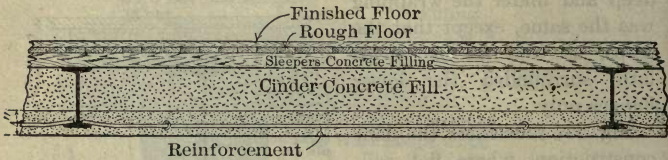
Flush Ceiling Concrete Slab Construction.
